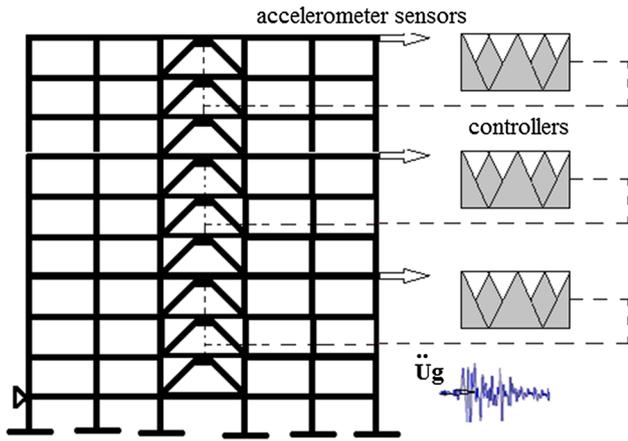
Position of dampers, accelerometer sensors and controllers in benchmark building
